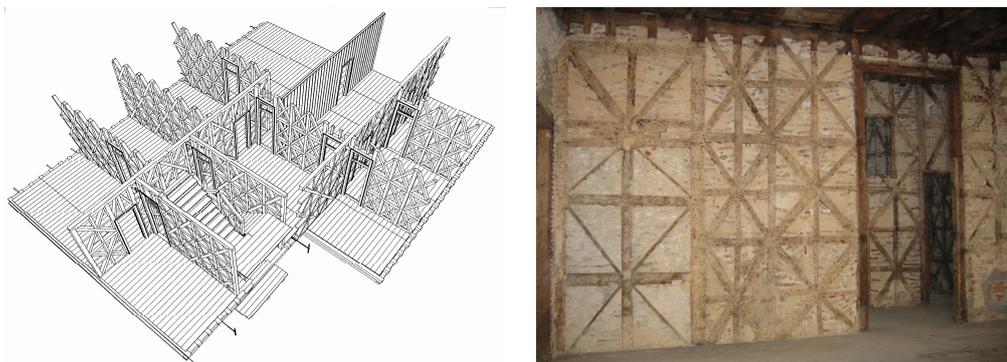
Details of the Pombaline construction. Internal timber frame walls.
